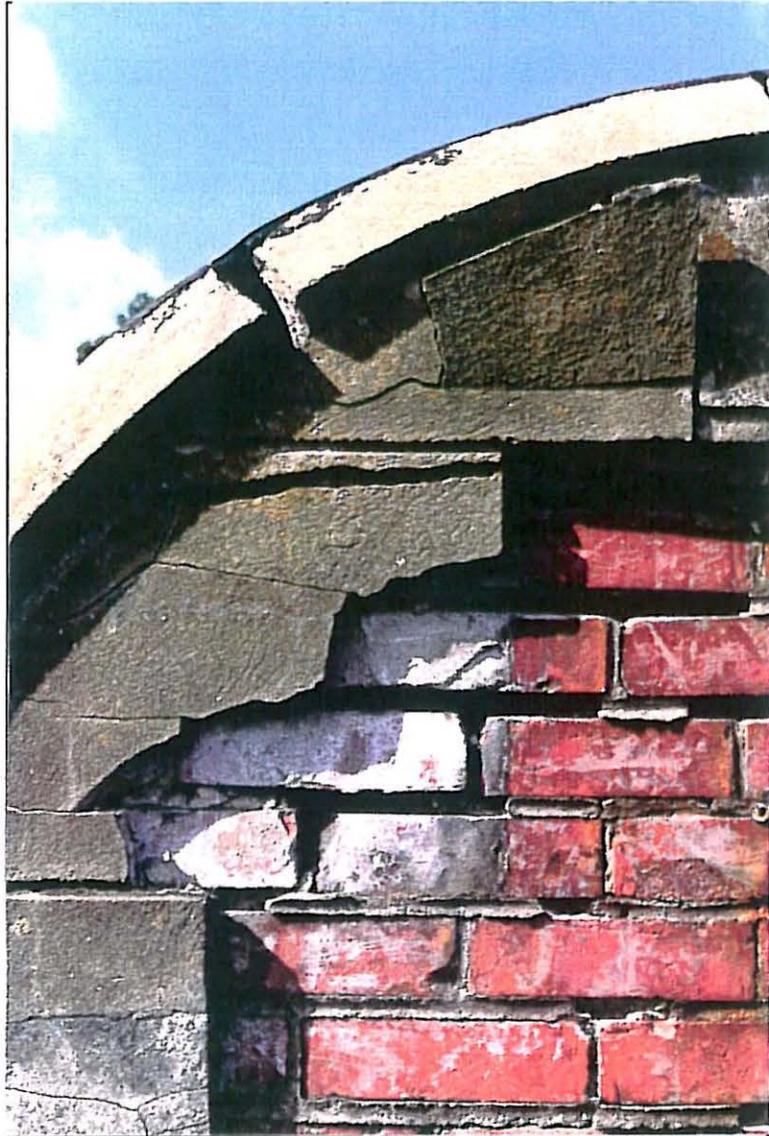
Deteriorating applied cast stone quoins on central gable, north elevation. Note unit failure with pieces of cast stone failing and lost. Note open joints in gable and in areas where cast stone is missing.
